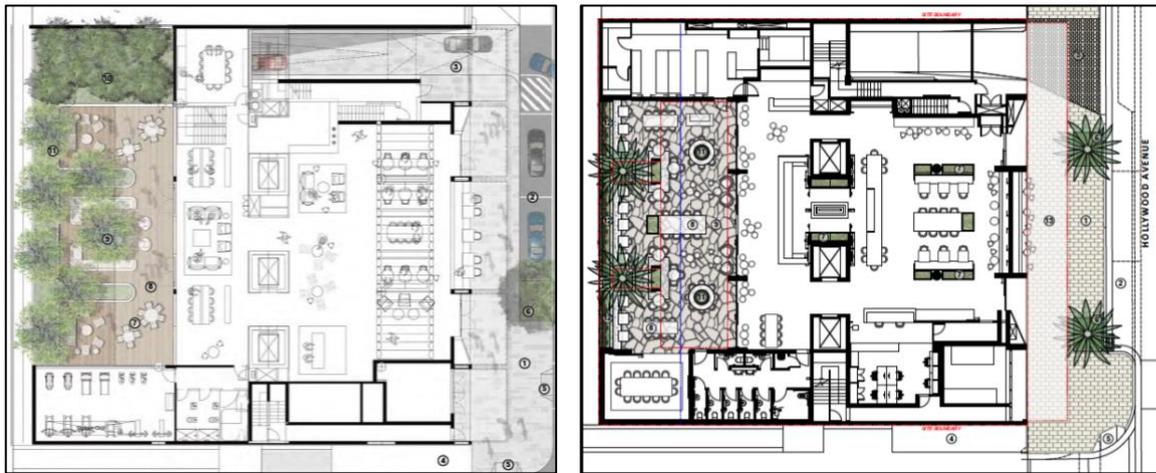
Approved Landscaping at the Ground Plane (Left) and Proposed (Right)
